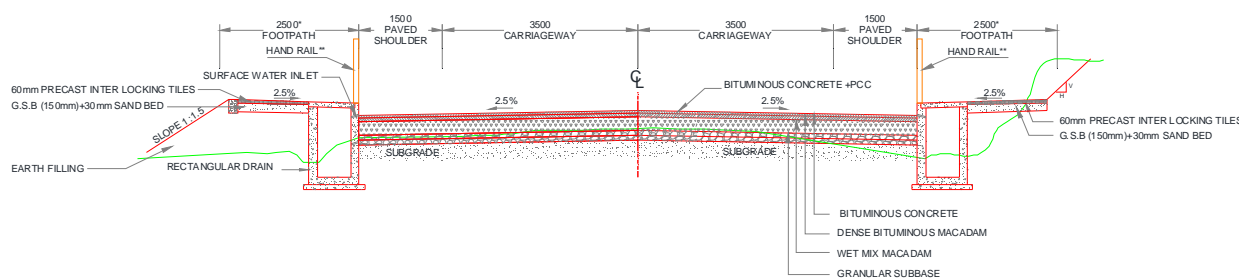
TYPICAL CROSS SECTION- TYPE-1A
